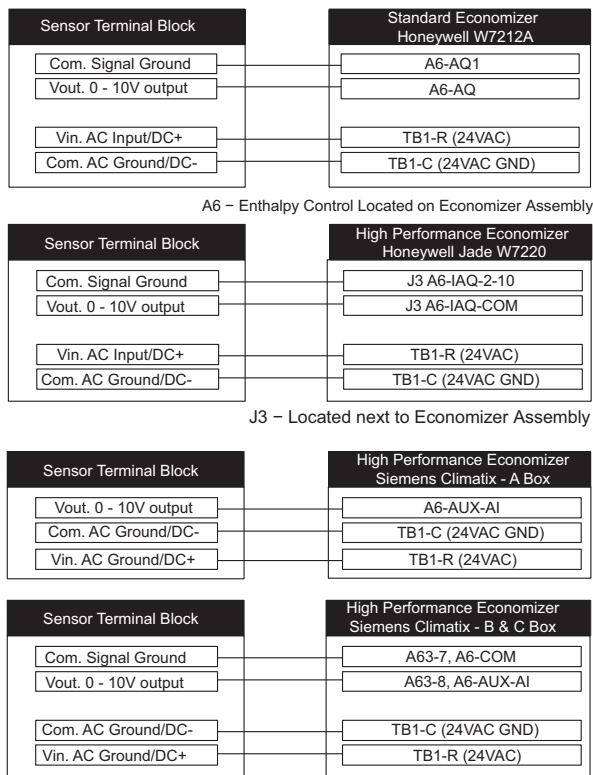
Field Wiring - 150' (46m) or Shorter Runs
